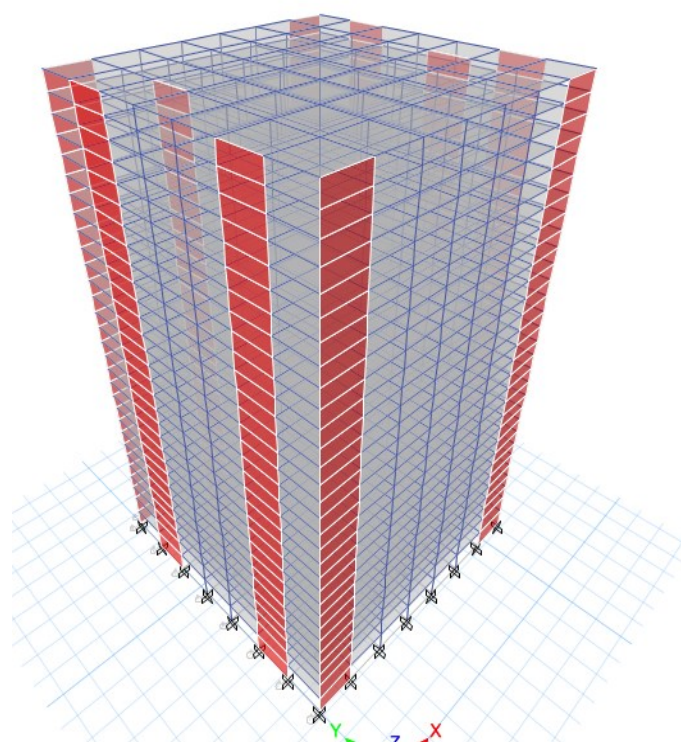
Model 1: Shear wall without any openings: 3D view
